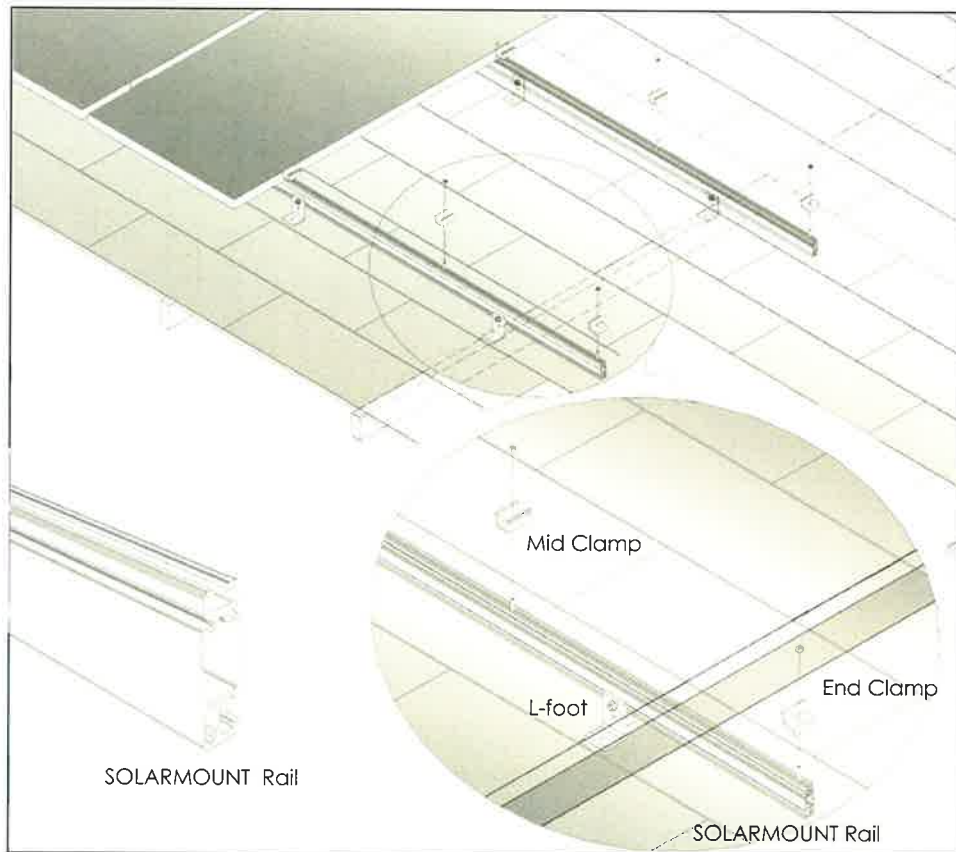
Exploded view of a flushmount installation mounted with L-feet.
